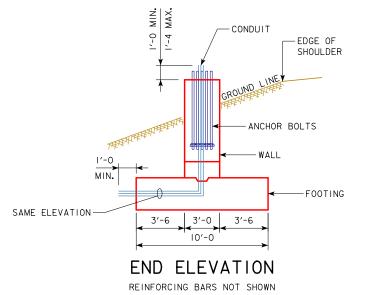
DETAIL R LOCATION OF CONDUIT WITHIN ANCHOR BOLT CIRCLE
